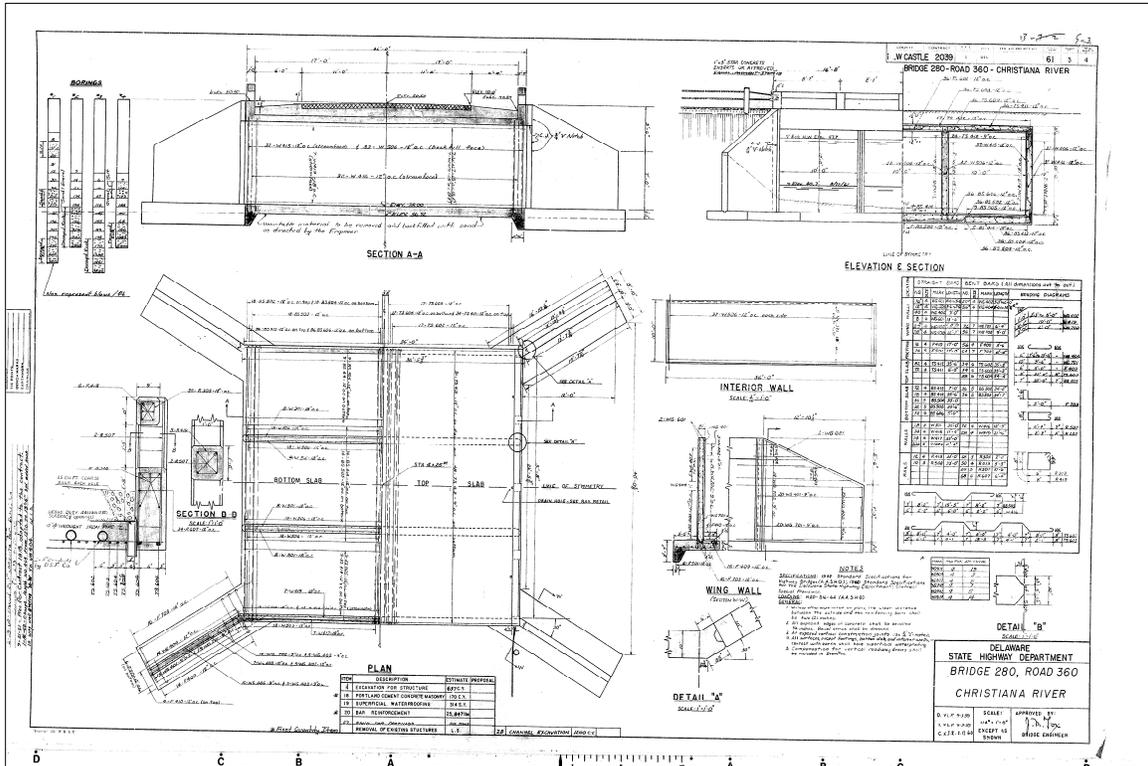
Contract 2039 Sheet 3 showing the construction plans for Bridge 1-280. The construction plans were signed on September 25, 1961. (DeIDOT Archives)
